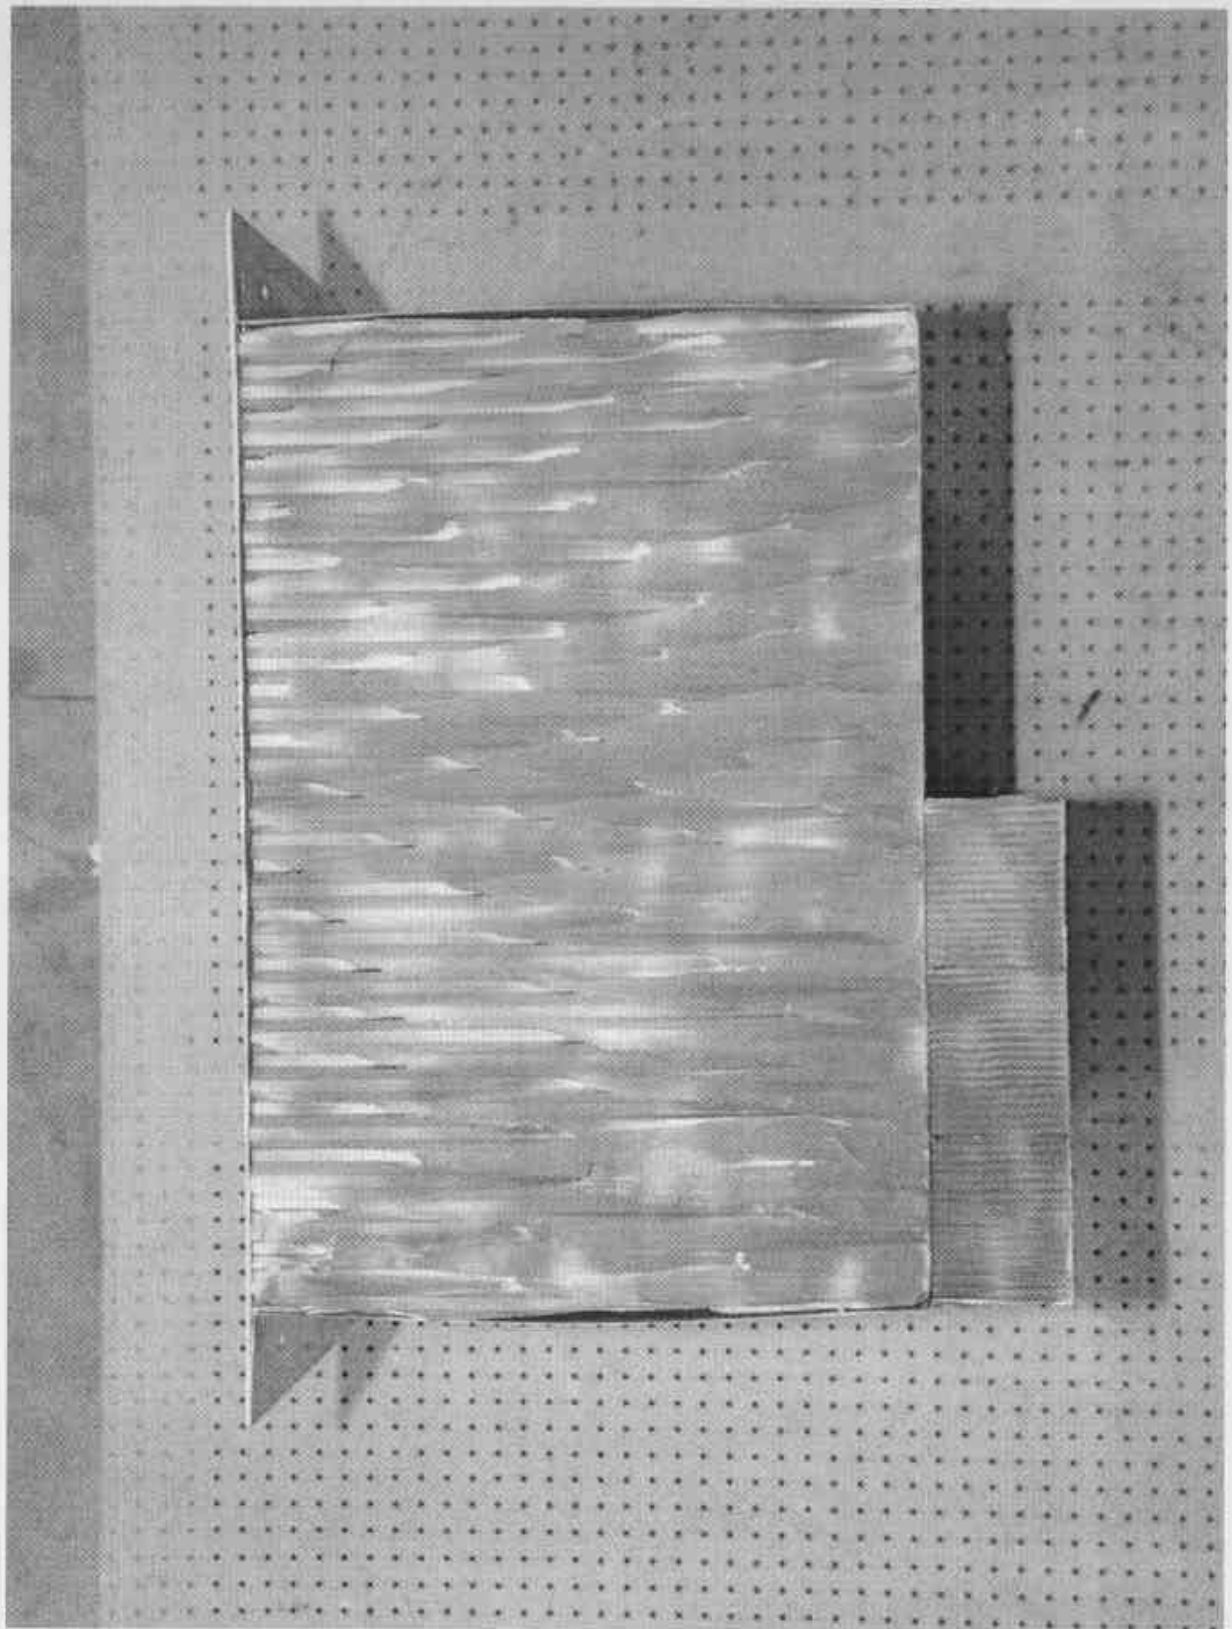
PRE TEST BARRIER LEFT SIDE VIEW
